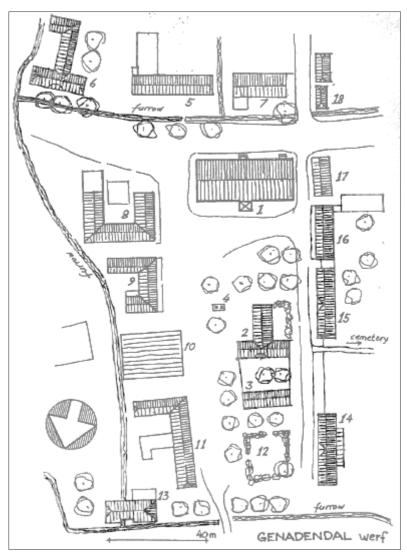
Plan of earth-constructed buildings of the Moravian Mission around Church Square in Genadendal
